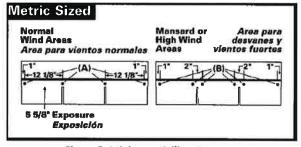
Minlmum Nailing, Supreme (Metric Size)
